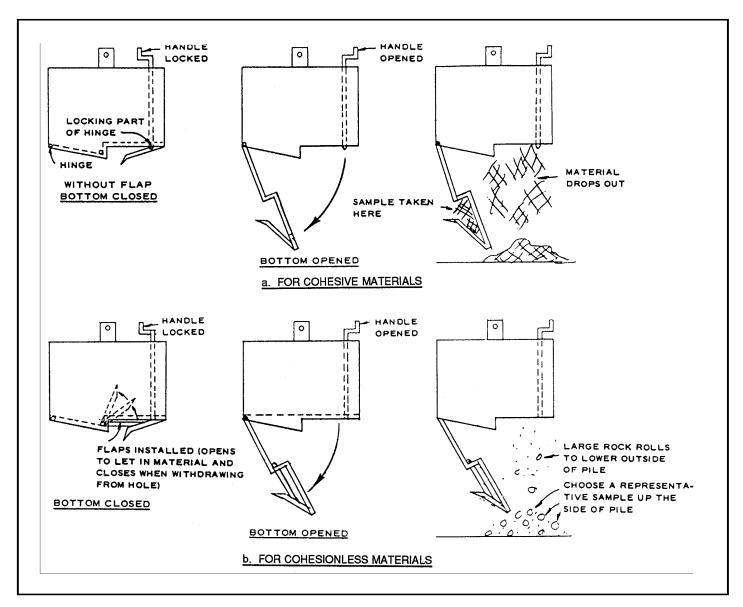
Schematic drawing of hinged drop-bottom buckets which were designed for rapid removal of cohesive or cohesionless soils
